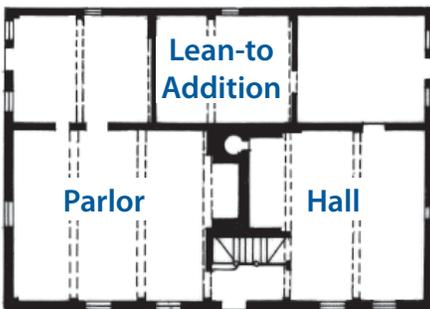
A typical New England saltbox features a steeply sloping roof to shed snow and a floor plan organized around a central chimney to conserve heat.
